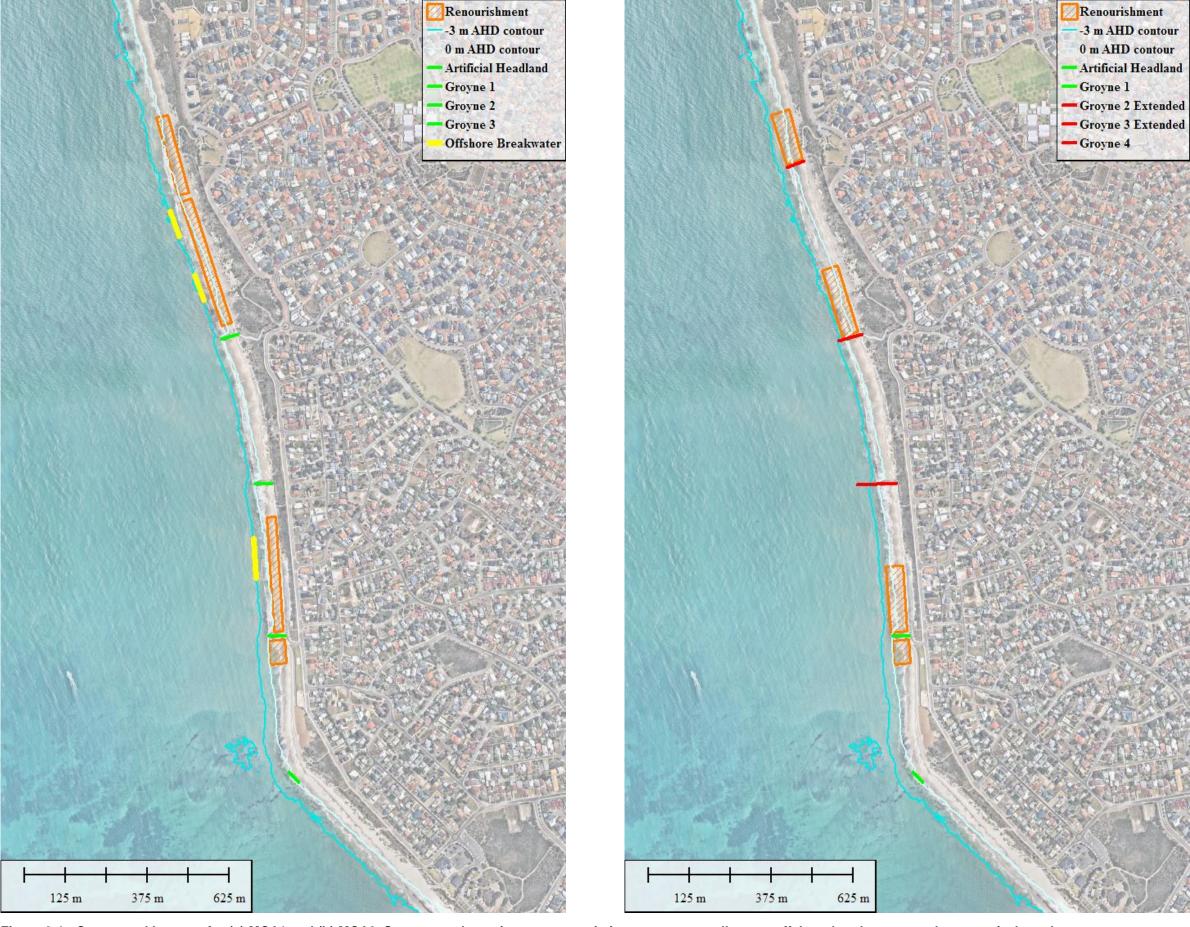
Conceptual Layouts for (a) MCA1 and (b) MCA2. Structures shown in green are existing structures; yellow are offshore breakwaters; red are new / adapted structures
